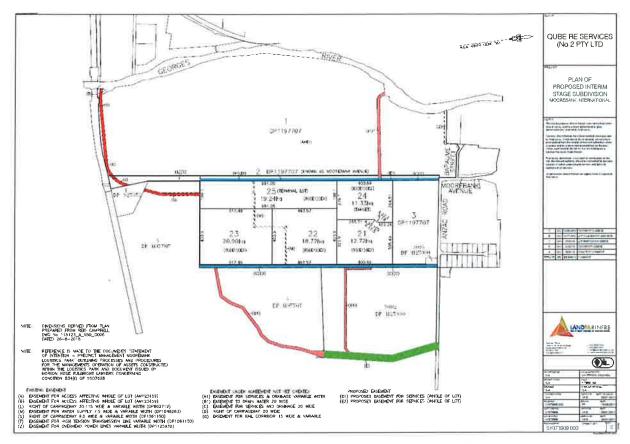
| MPE Stage 2 Subdivision Plan (Source: Subdivision Report) Note: North is to right of figure (cf. Figure 3)
